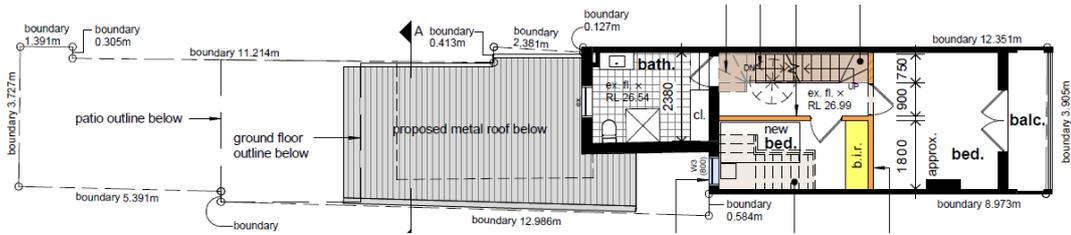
Proposed first floor plan – 3 Oswald Street Randwick (Source: John Spiteri Design and Drafting)
